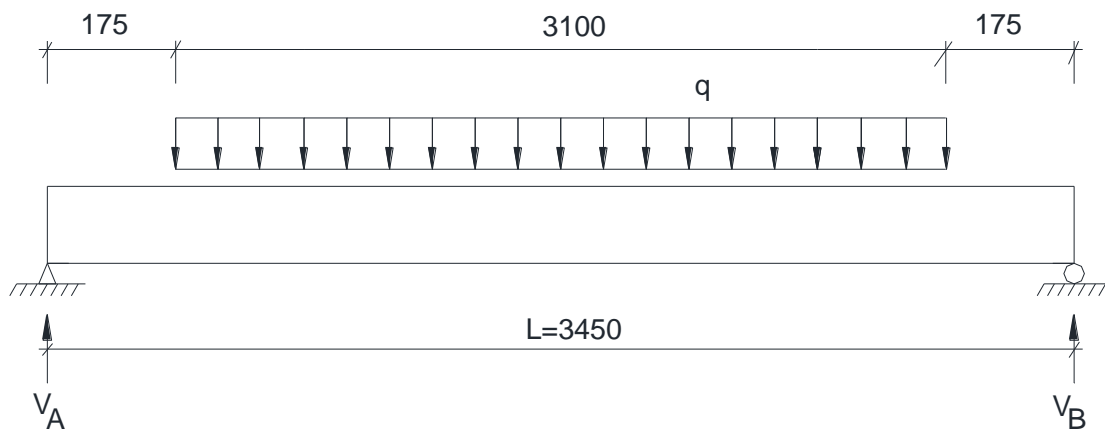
The bridge deck is assumed to be simply supported between the main girders.
